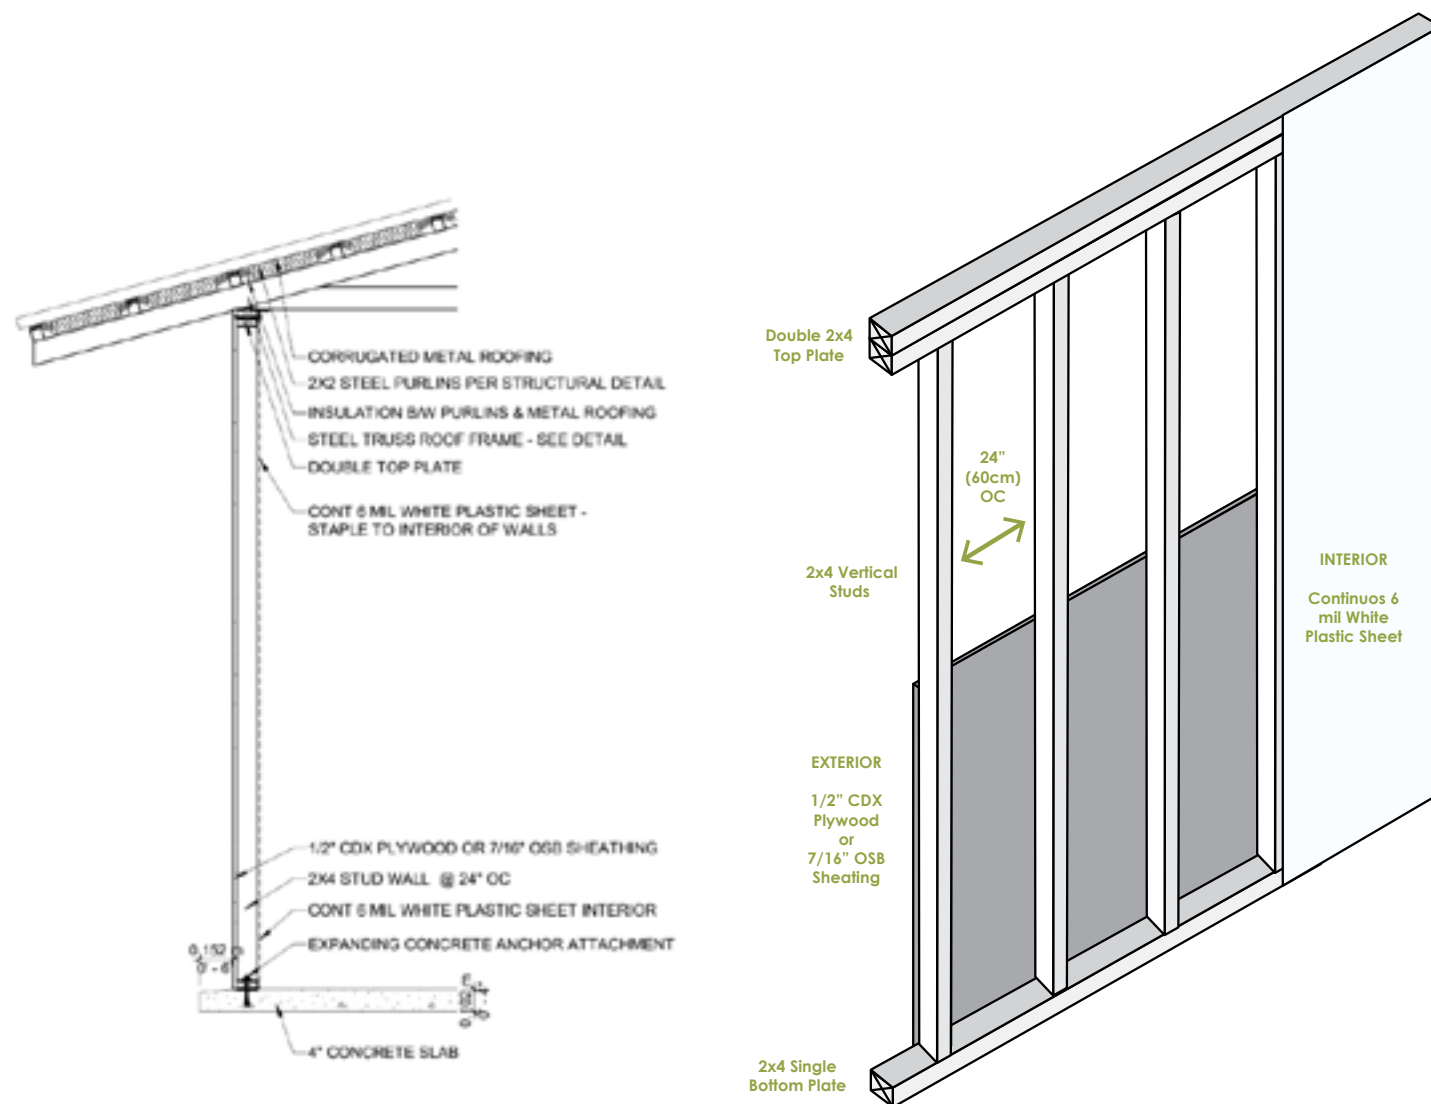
Drawing Details and 3D view of Sample Wall Configuration for Low-Resource Settings
